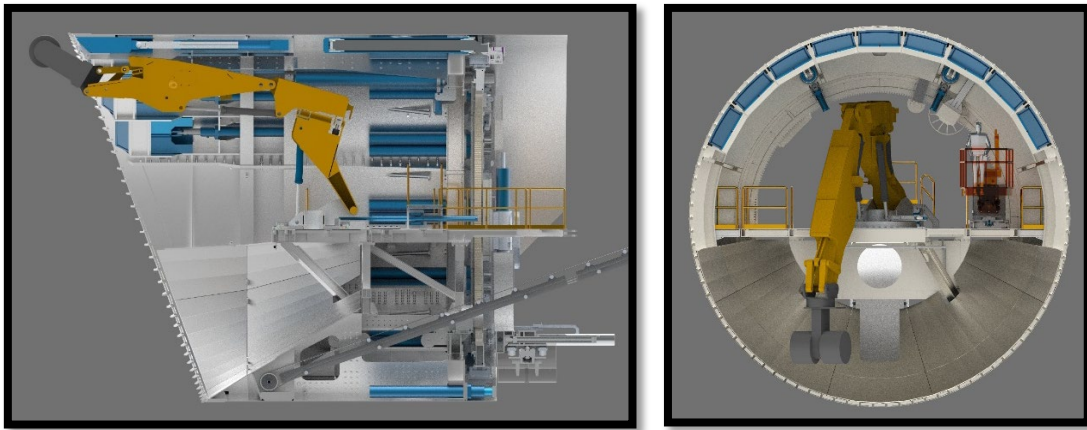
Digger shield assembly – Side View (left) and front view (right)
